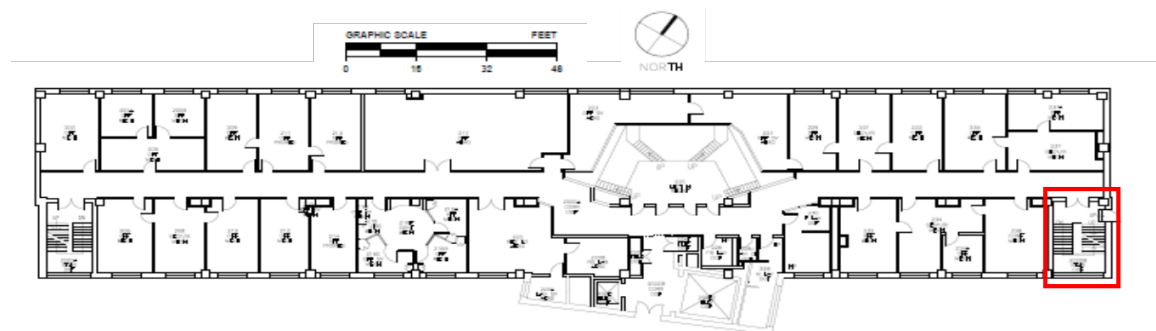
The floor plan of Building 35 with the stairwell in red box.
